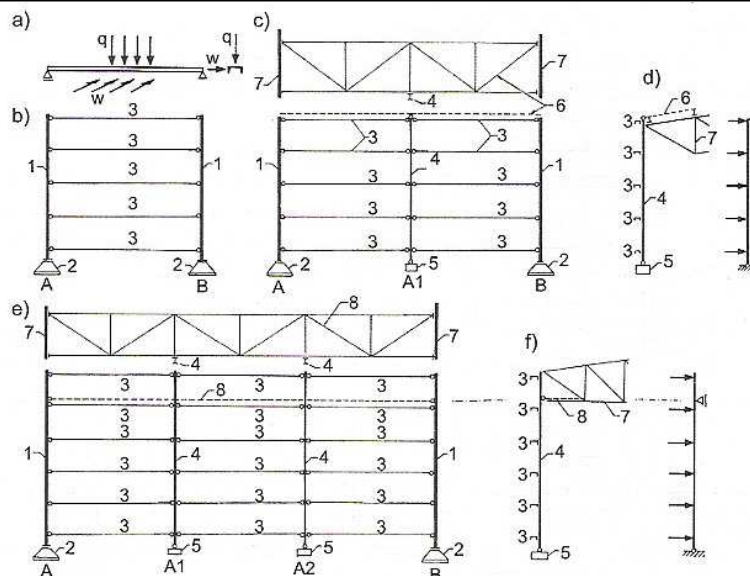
Bearing structure of the sidewall: 1- primary column, 2,5- foundations, 3- wall girt, 4- secondary column, 6- longitudinal roof bracing, 7- roof rafter, 8- longitudinal truss bracing in the plane of bottom chord
